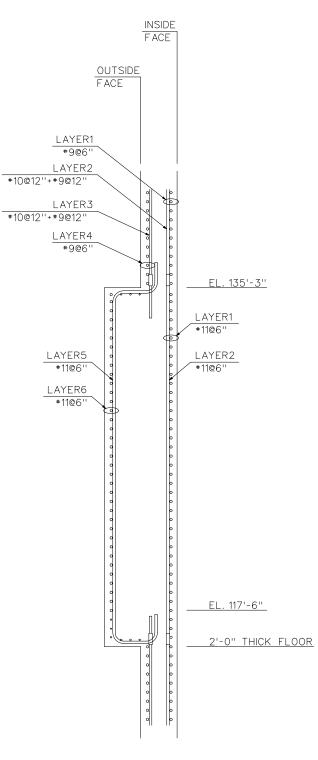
H.5-5 (Sheet 2 of 3) [Concrete Reinforcement Layers in Wall 11 (Looking East)]
